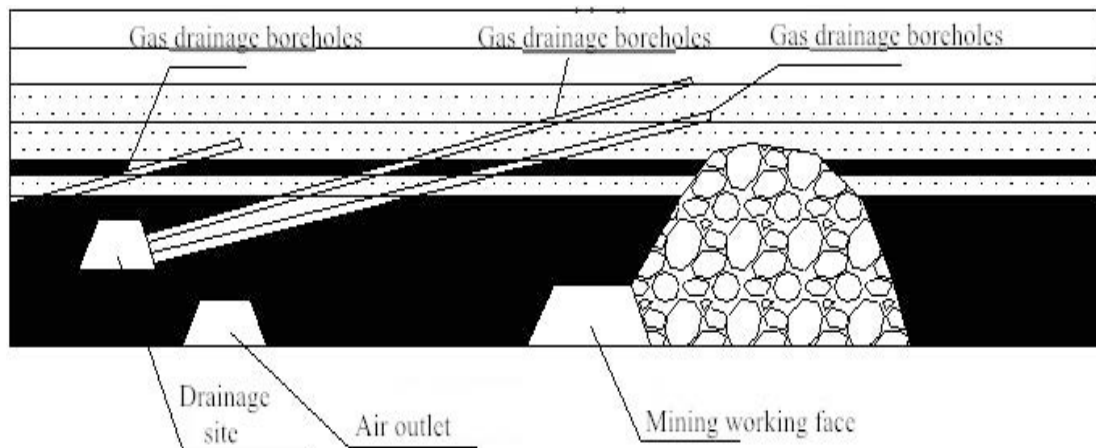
Section of the gas drainage boreholes layout and arrangement
